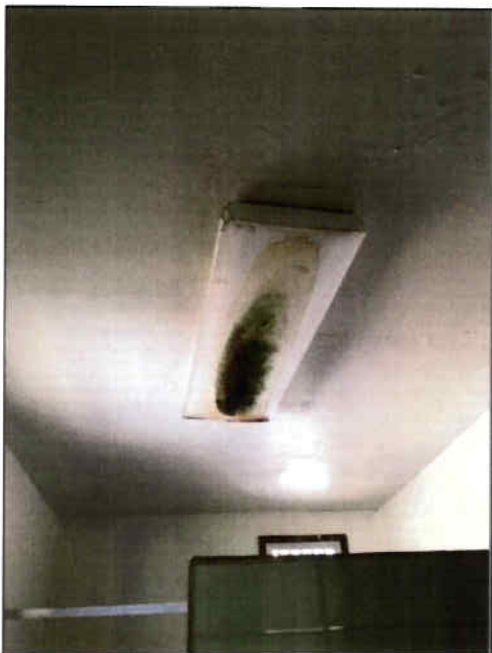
(Left) Annex Building, Detail of Water/Mold Damage to light fixture. Taken 11/7/2017.
